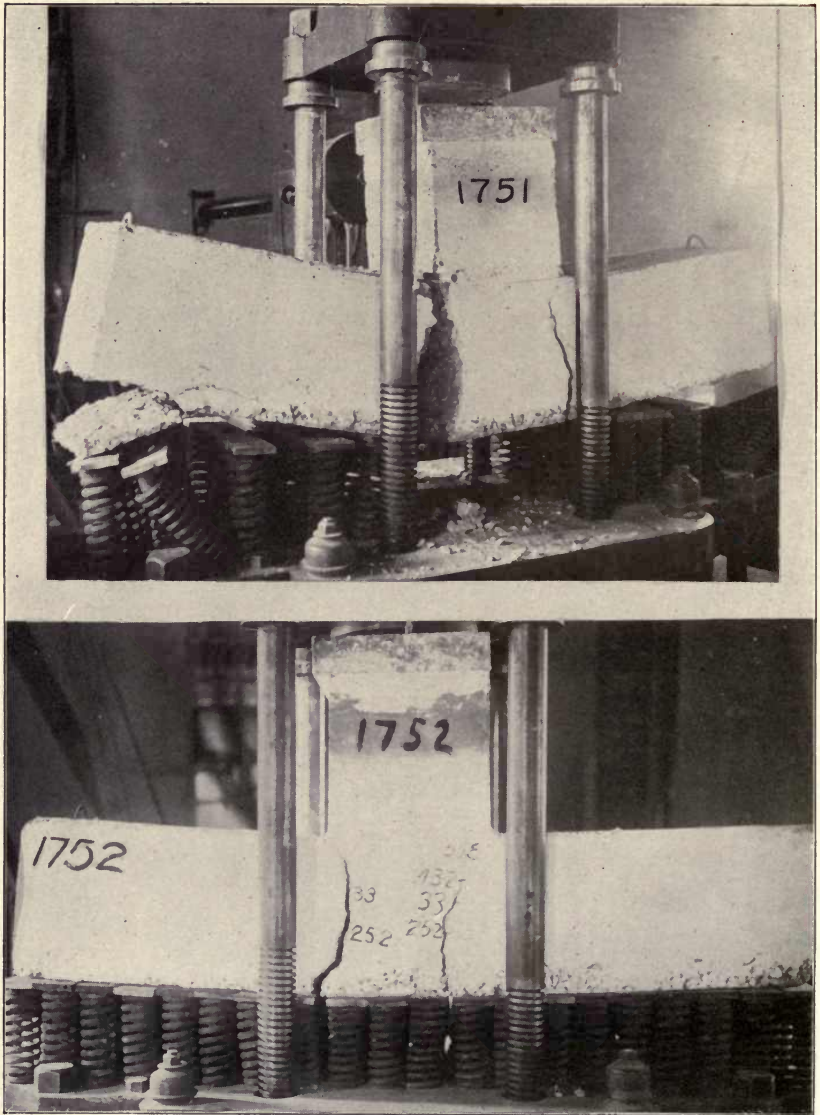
VIEWS OF REINFORCED CONCRETE WALL FOOTINGS AFTER TEST.
